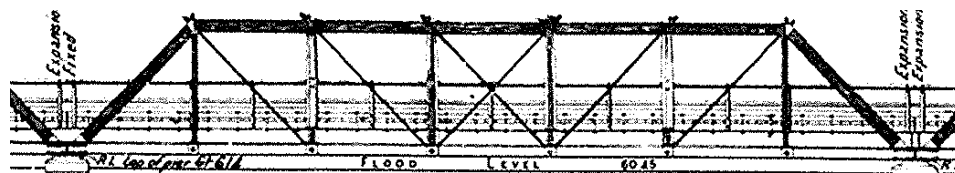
de Burgh Truss: Bridge over Queanbeyan River at Queanbeyan (diagonal principals)
